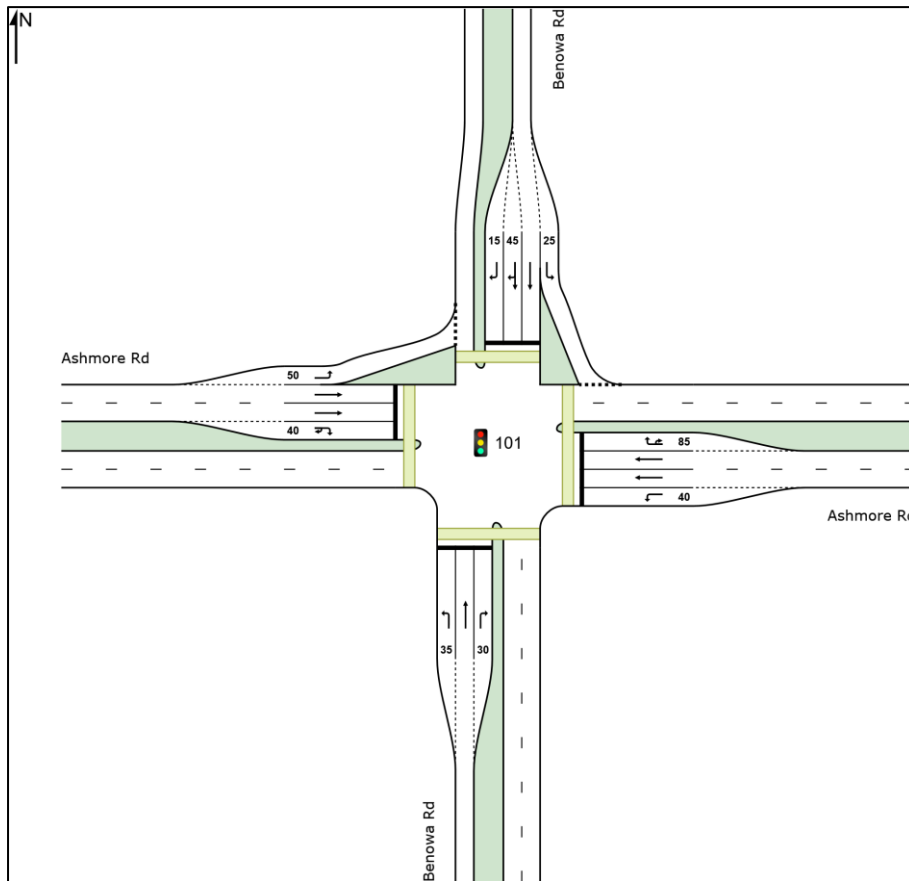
Ashmore Road / Benowa Road Intersection (Existing Configuration) – SIDRA Layout
